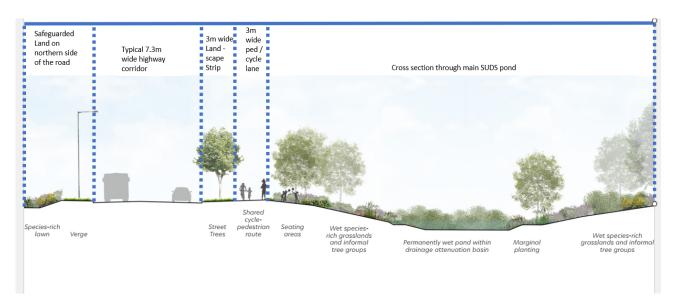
An indicative cross section of the road showing the proposed infrastructure. Please note that the width of the road varies depending on the highway requirements as shown on the layout plans (a larger drawing is included in the appendix)
